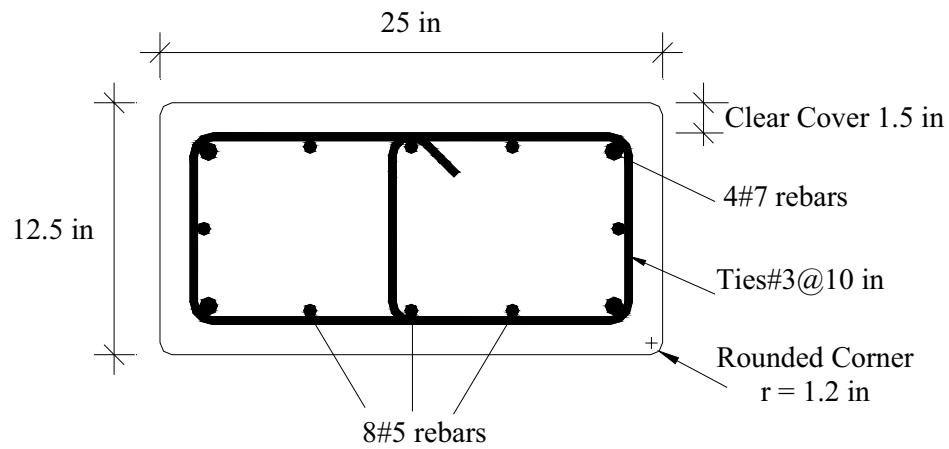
Section A-A & C-C; Type B Tie; Specimens B1, B2 & B3
